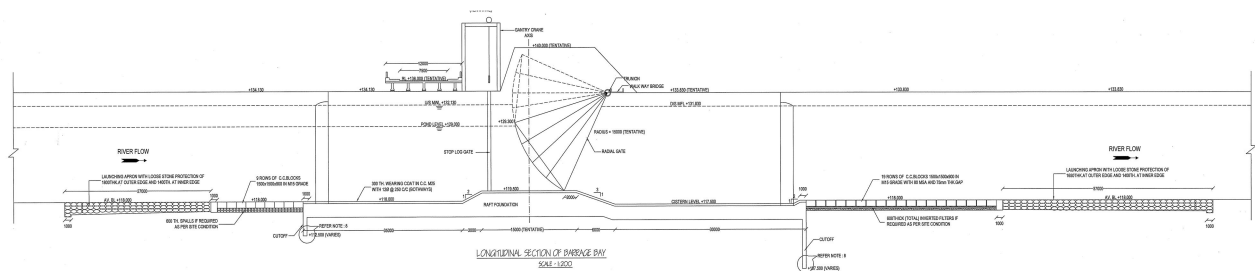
Longitudinal sectional details of Sundilla (Parvathi) barrage
